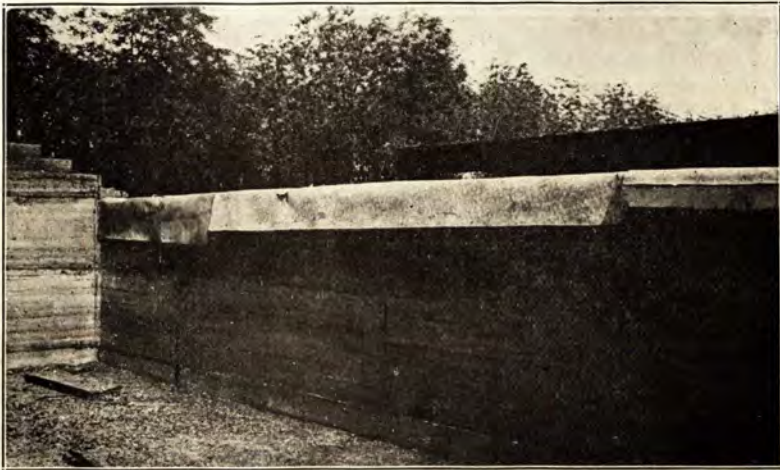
PROTECTING THE TOP OF RAMMED EARTH WALLS DURING CONSTRUCTION.
